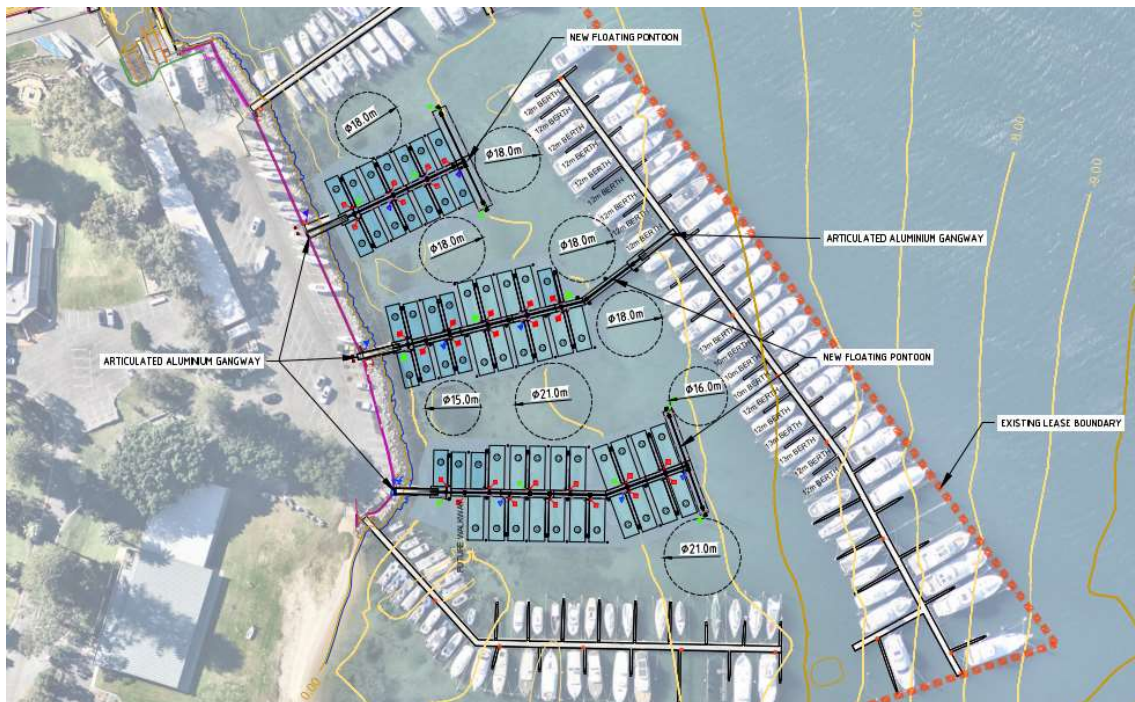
Site overview with D, E and F Jetty berthing arrangement
